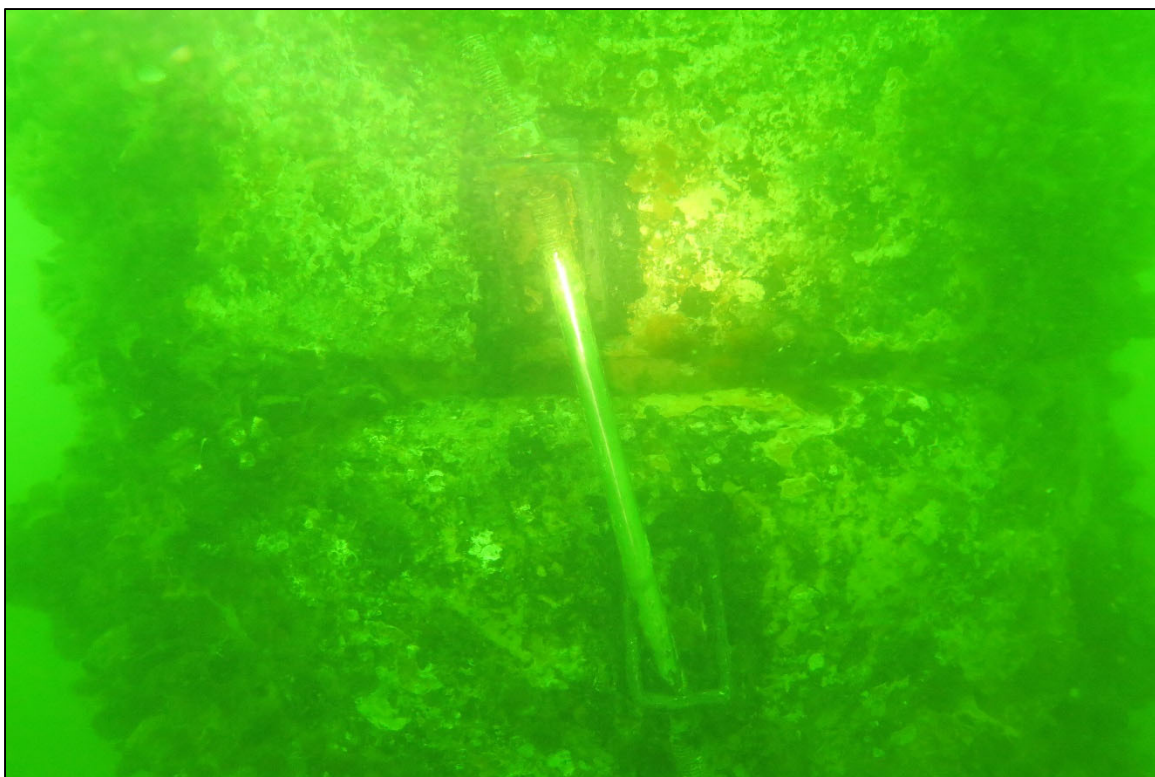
Stainless-Steel Anchor Bolts Bent (Cap Appears Twisted/Rotated Counter-Clockwise), Diffuser E3 Southeast Bolt.
